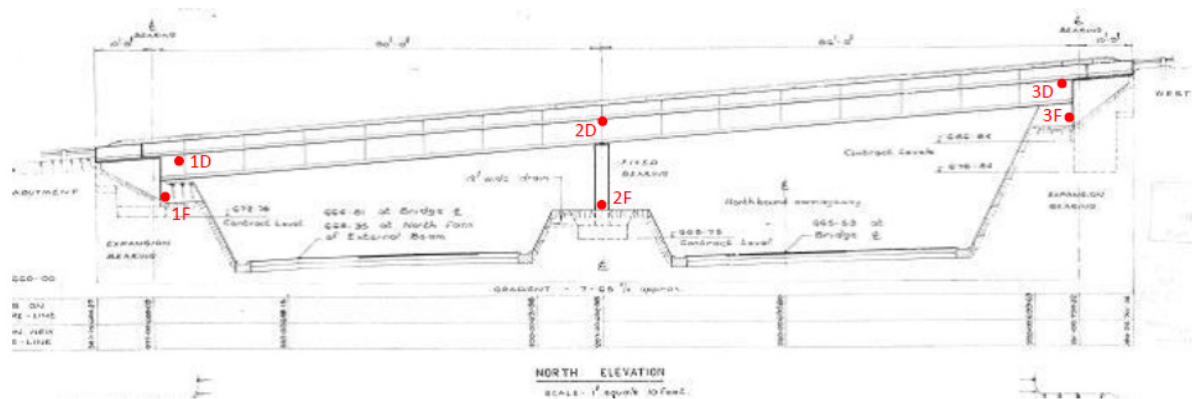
Cawley Road Overbridge – Survey Monitoring Points
